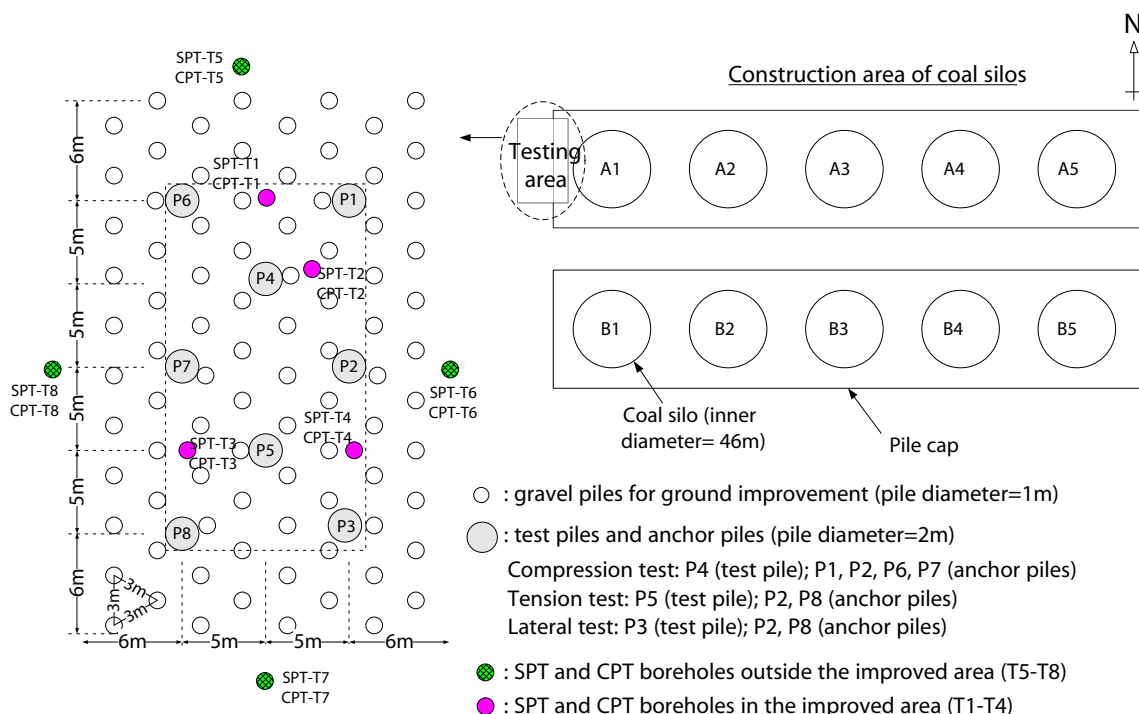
Construction site of coal silos and test site of pile loading tests.
